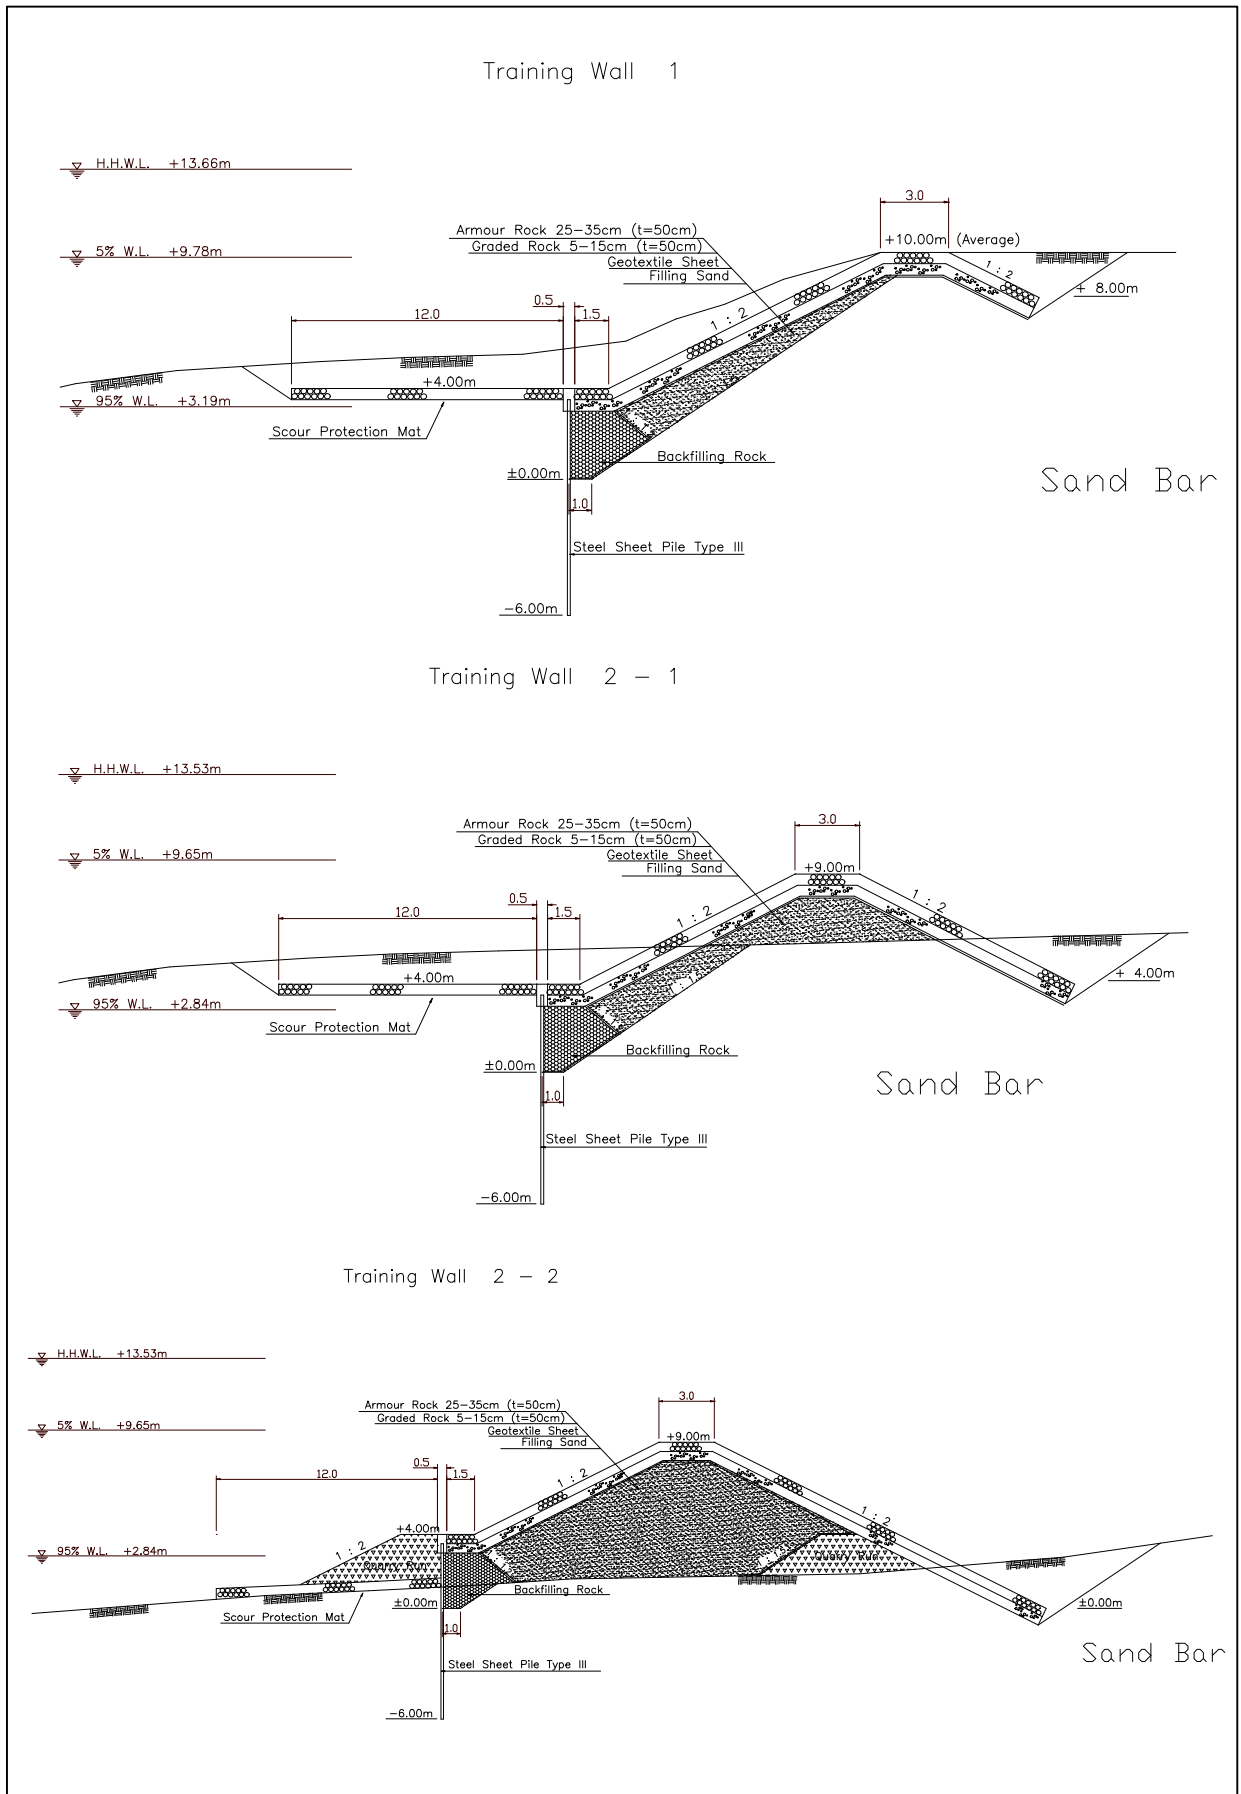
Typical Profiles of Training Walls (Training Wall-1 and 2)
